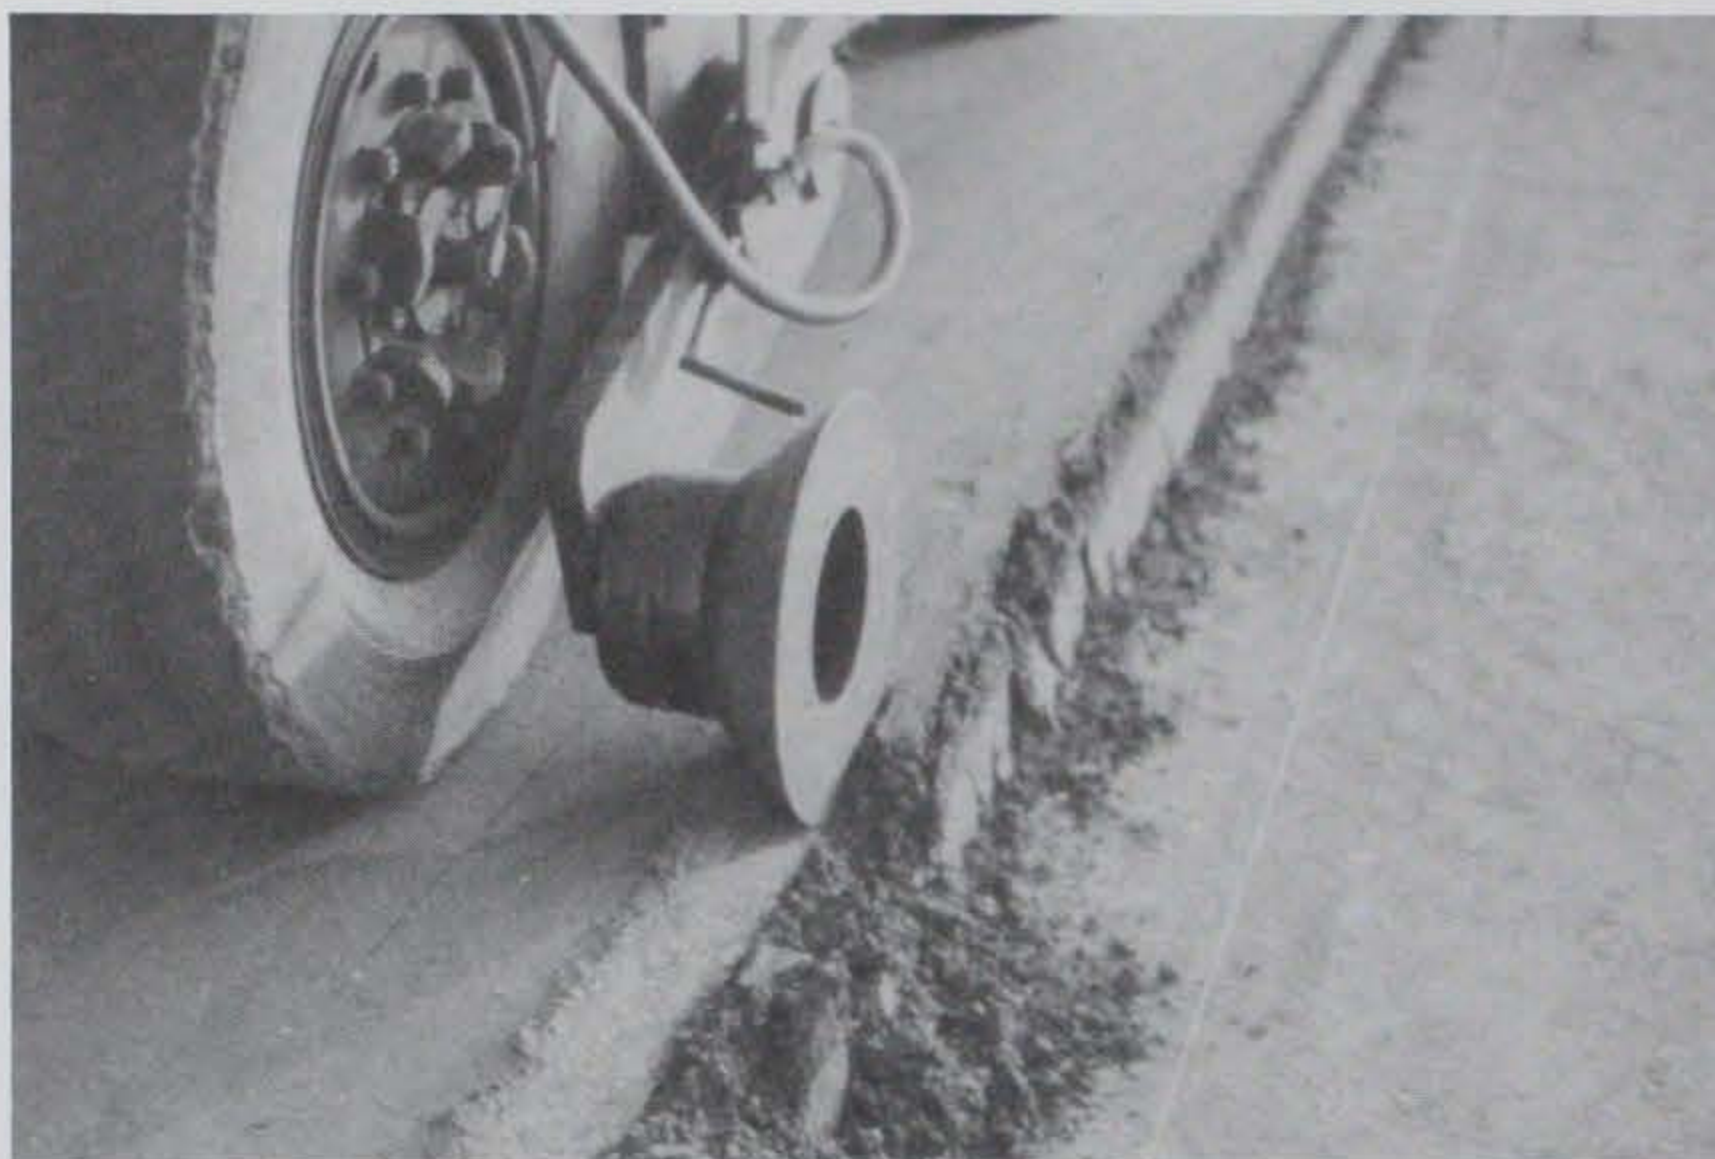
An asphalt cutting wheel was tried for trimming the edge, but it produced an unacceptable joint
